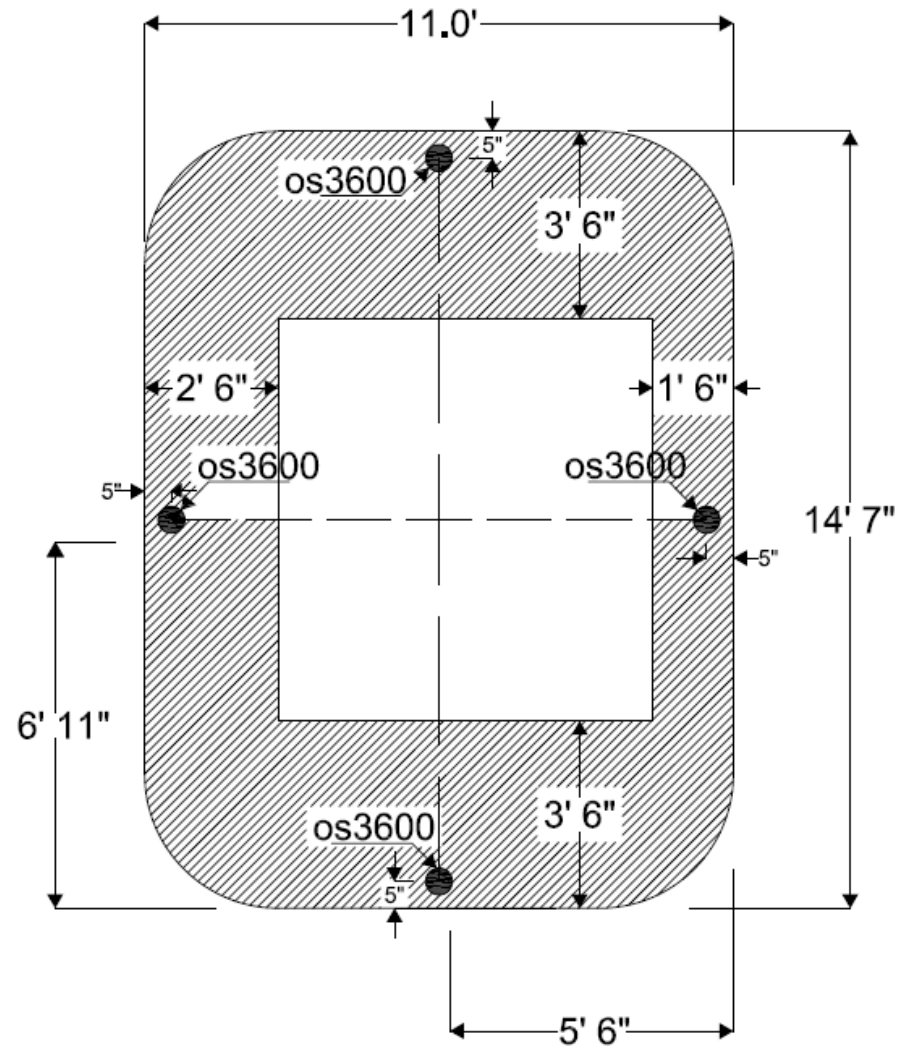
Cross-section of pylons 6 East and 6 West showing location of strain sensors at lift T1 (elevation 52')
